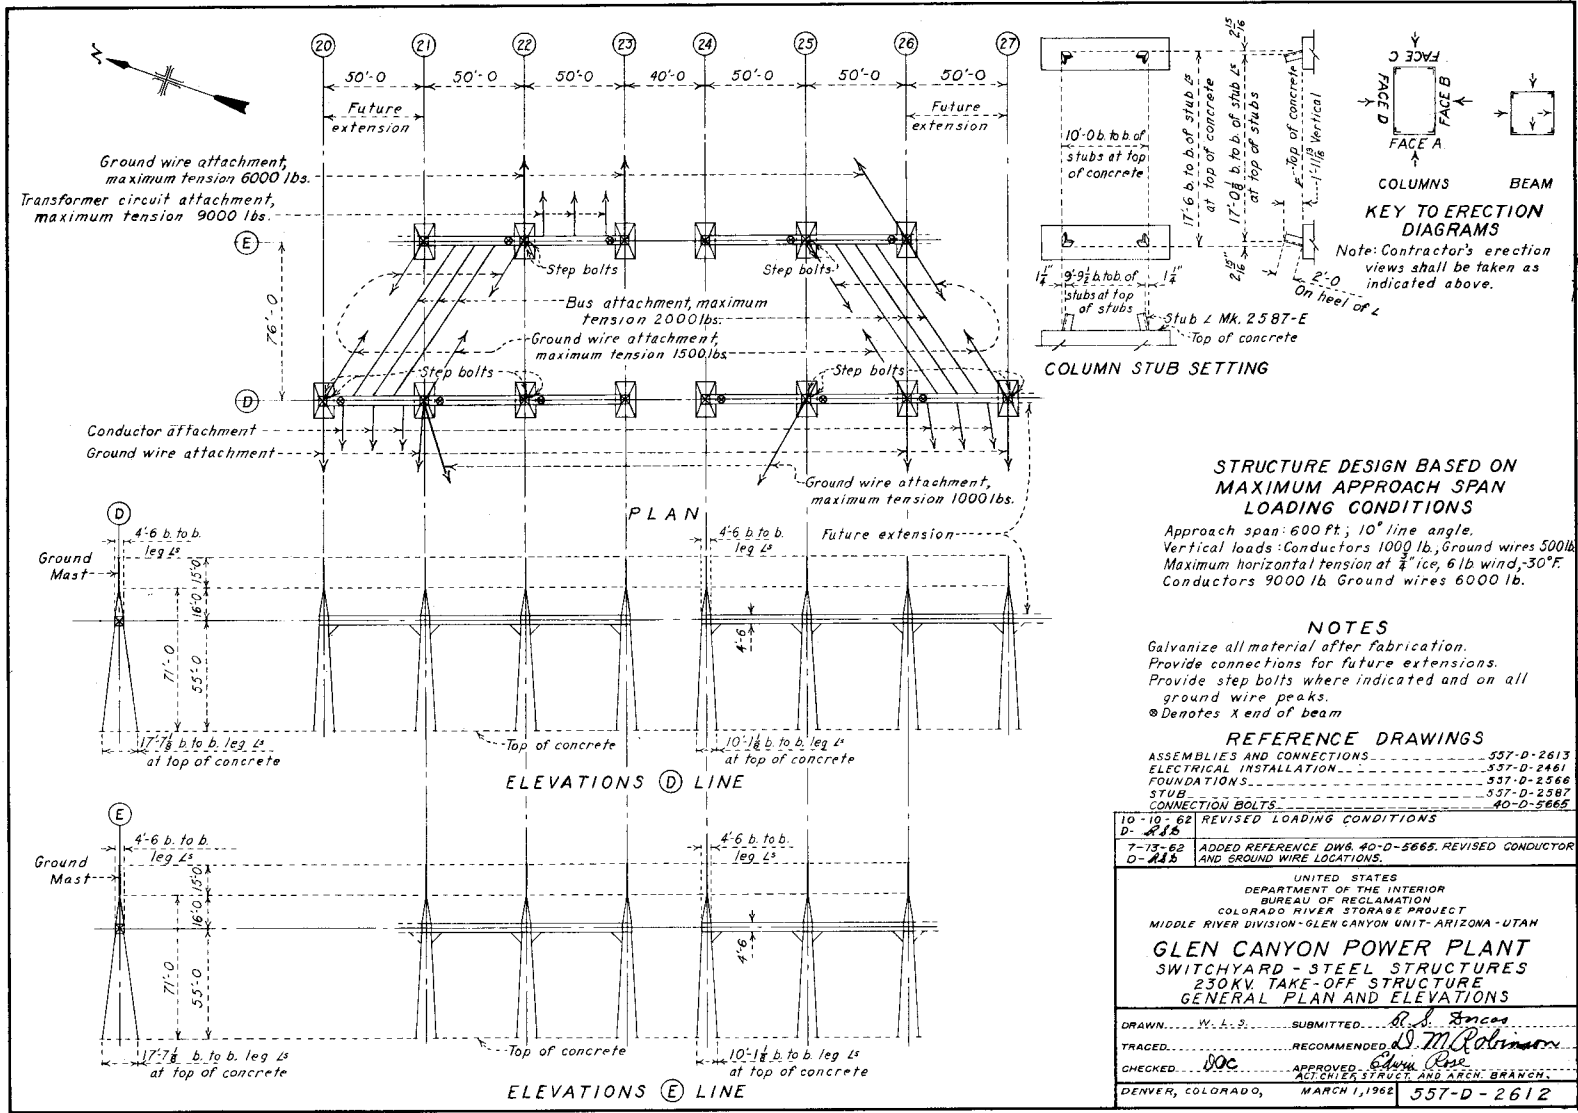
Switchyard 230-kilovolt steel takeoff structure—General plan and elevations.
